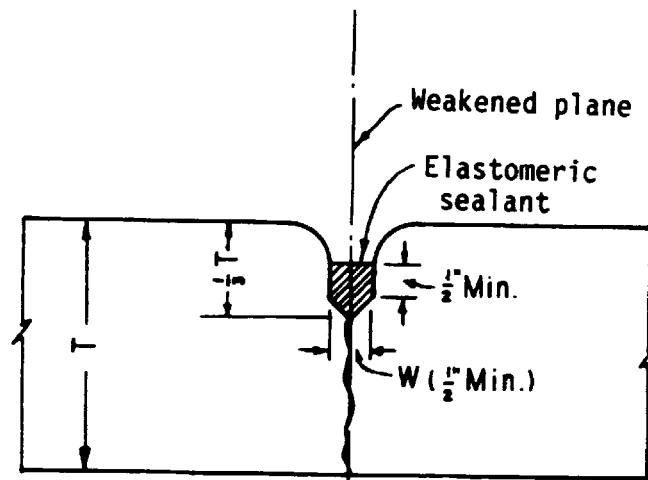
Canal contraction joint used with elastomeric sealant. The V-shaped groove is tooled into fresh concrete and creates the weakened plane.
